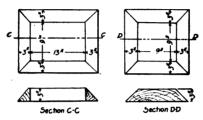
Forms for Constructing Openings for the Entrance of Ducts into Concrete Vaults.
